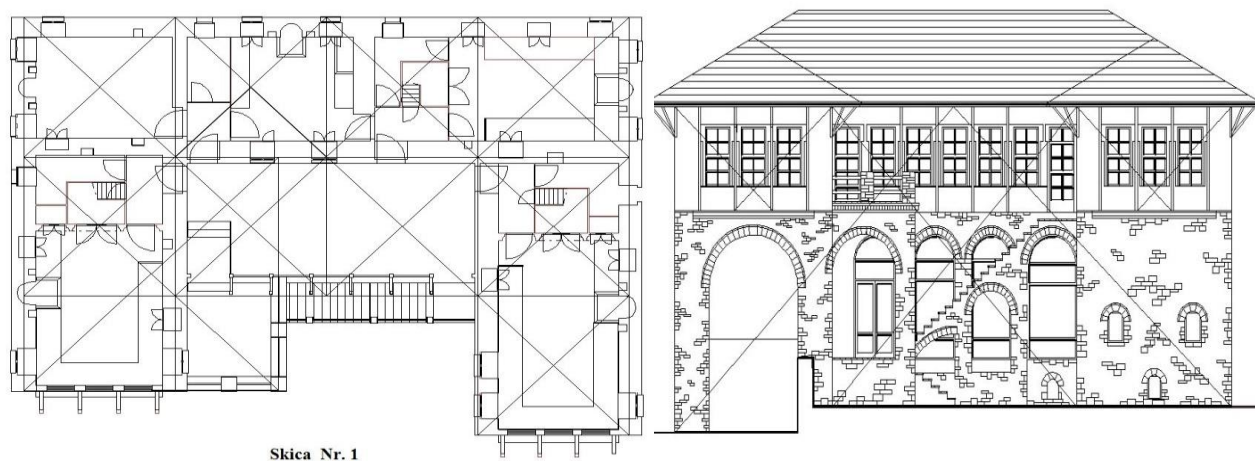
The geometry of the house in plans and façade. Image provided by Agron Doraci.
